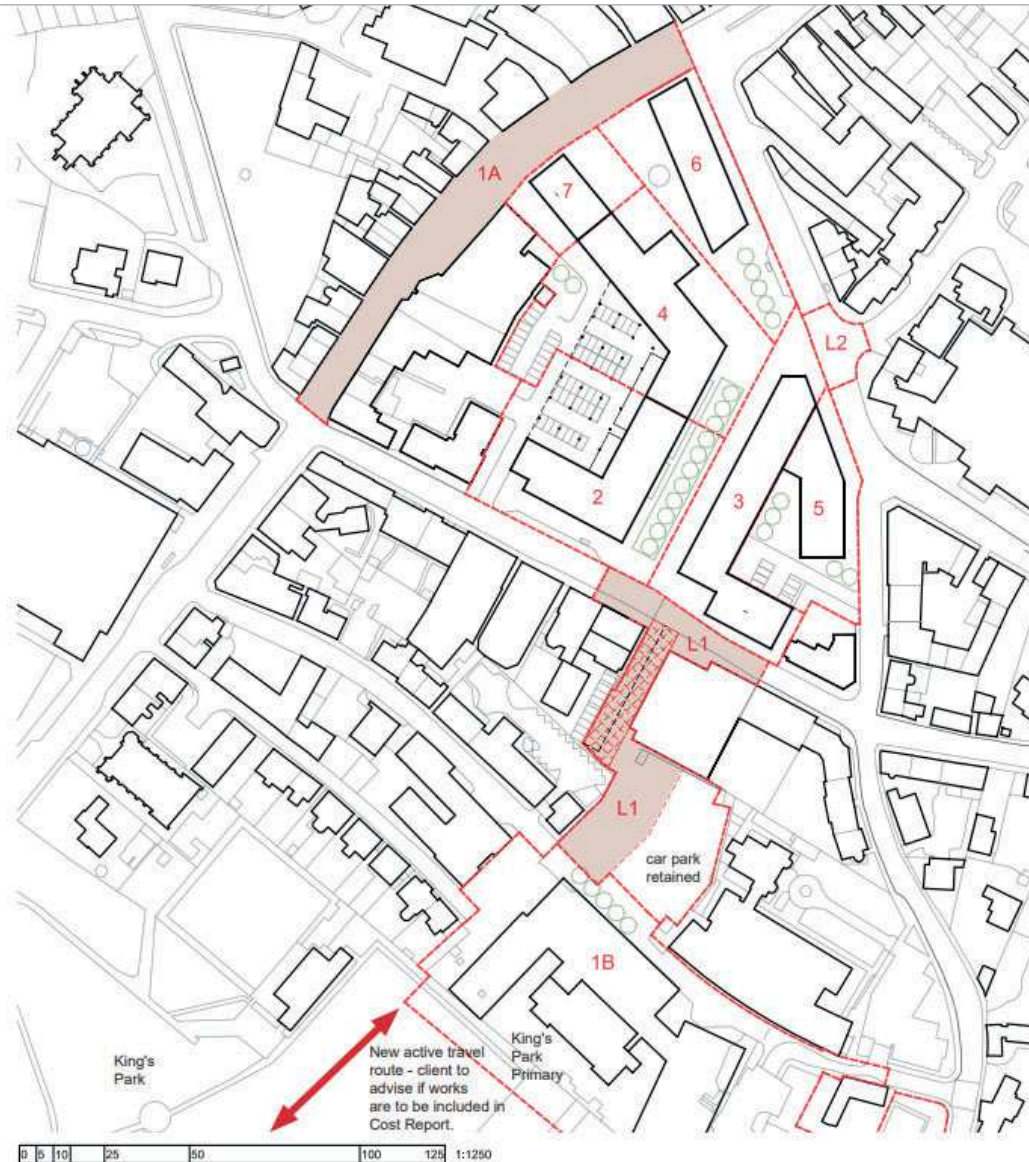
Location plan of traffic calming measures within town centre (© Reich & Hall)
